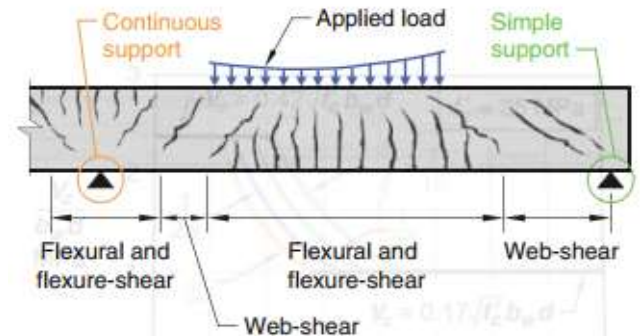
Types of cracking in concrete beams.
